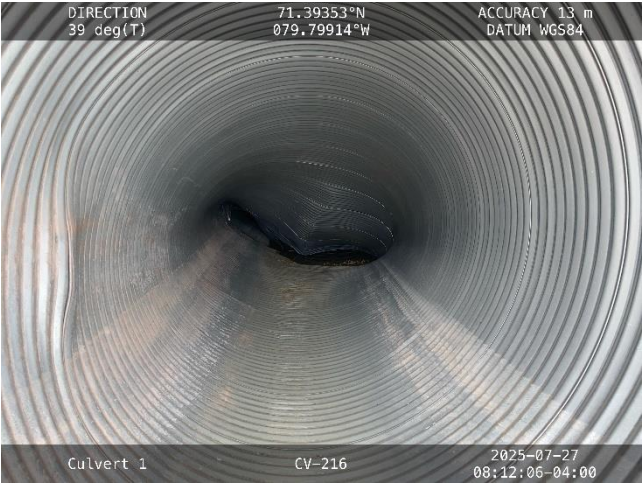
Culvert Crossing CV216 – Culvert 1 upstream
